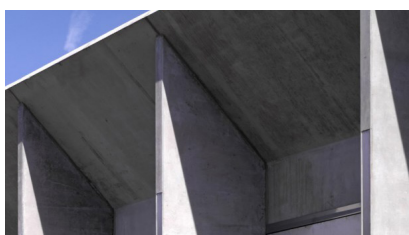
Exposed concrete is a durable material that can be used in a number of ways to articulate a building form.
